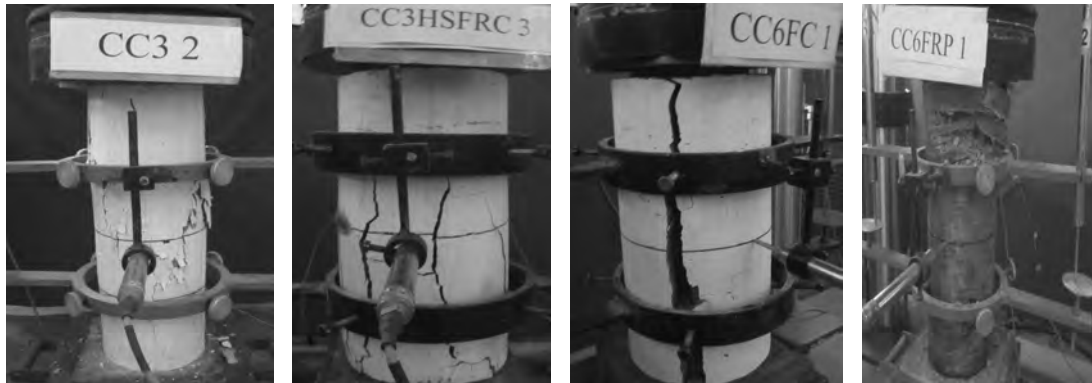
Failure pattern of heat damaged cylinder and strengthened specimens
